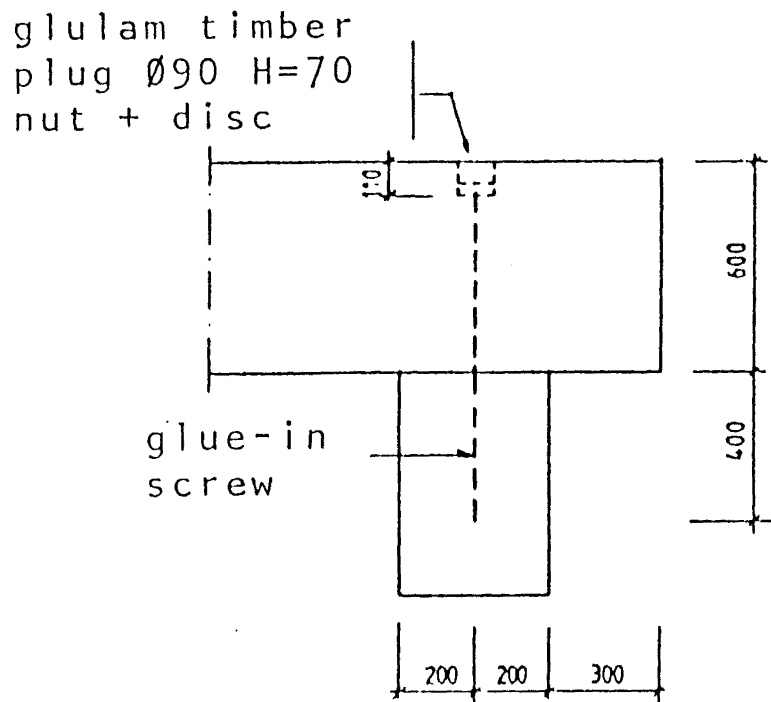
Fire tested beam-to-column joint with glue-in screw.
